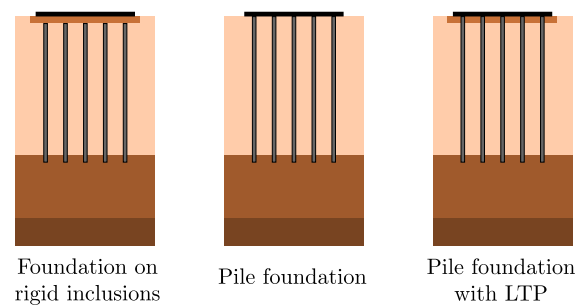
Layout of reinforced foundation and different pile foundations
